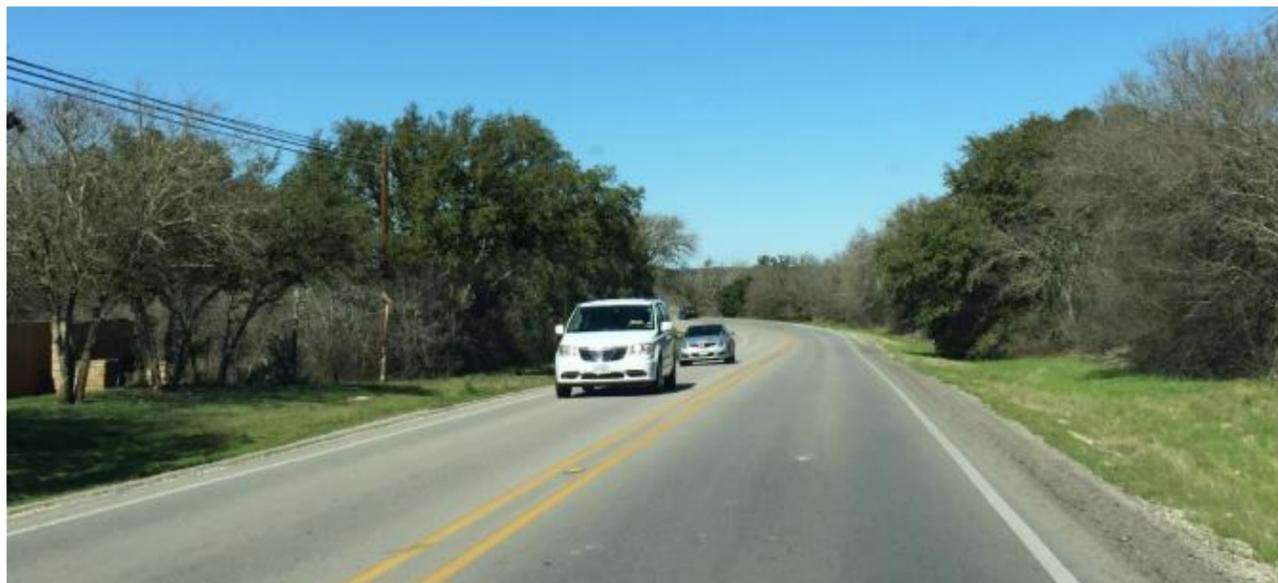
Existing Roadway (traveling westbound on FM 150)
